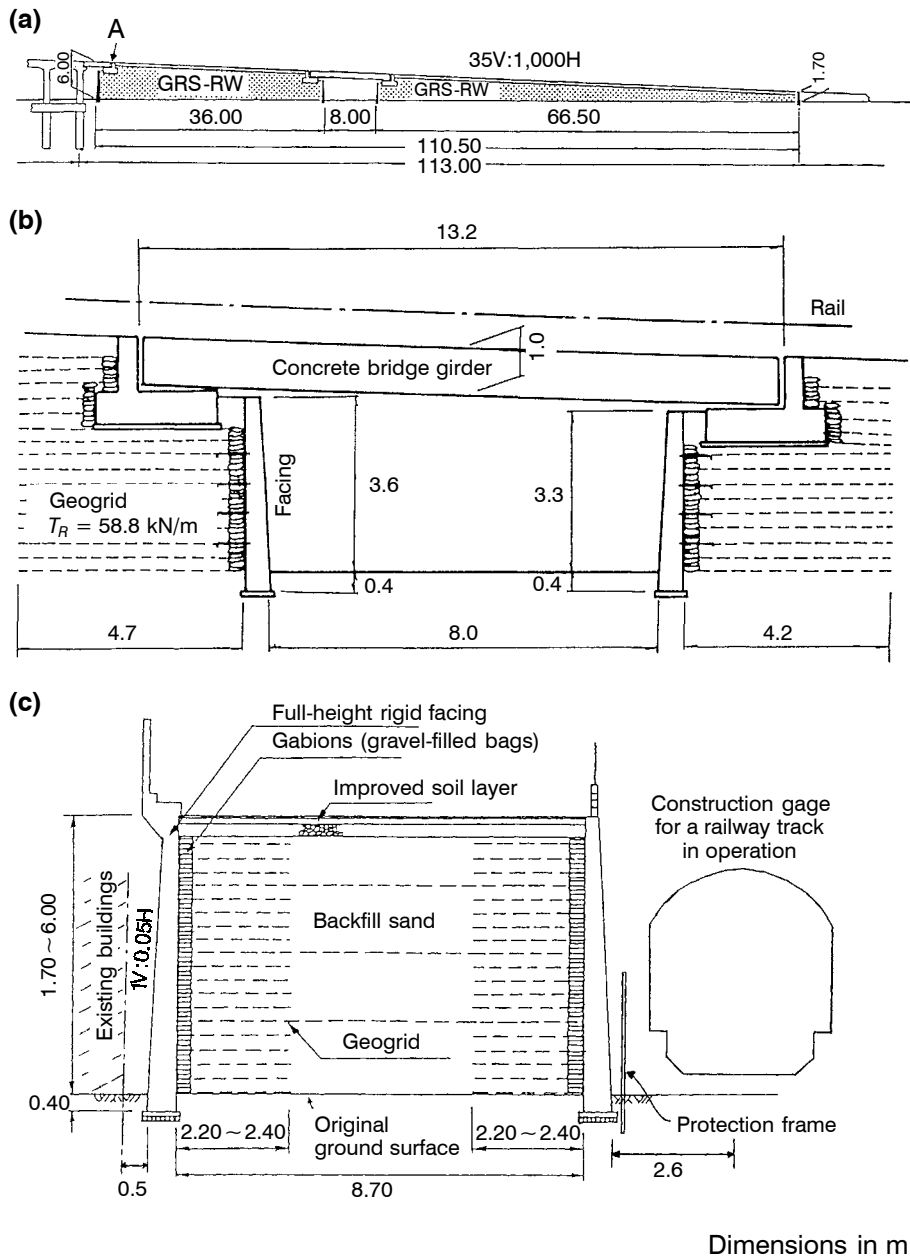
An abutment constructed as part of a GRS-RW system for the Seibu Line in Tokyo (Location 42, Figure 3): (a) general longitudinal section; (b) longitudinal section of the bridge abutment; (c) detailed cross section of the bridge abutment.
